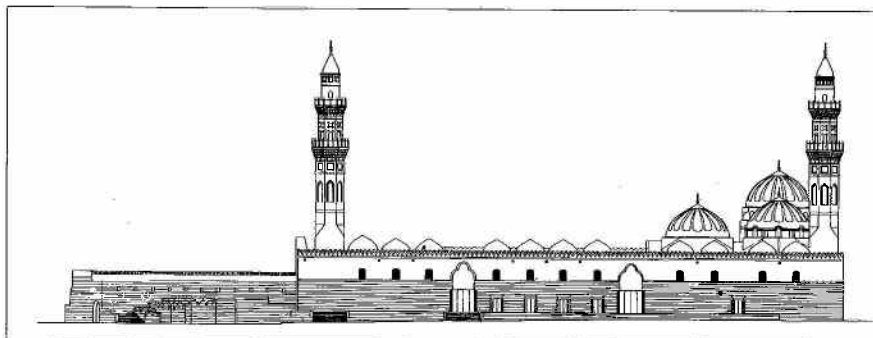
Elevation of mosque showing domes, diaphragm walls and minarets
